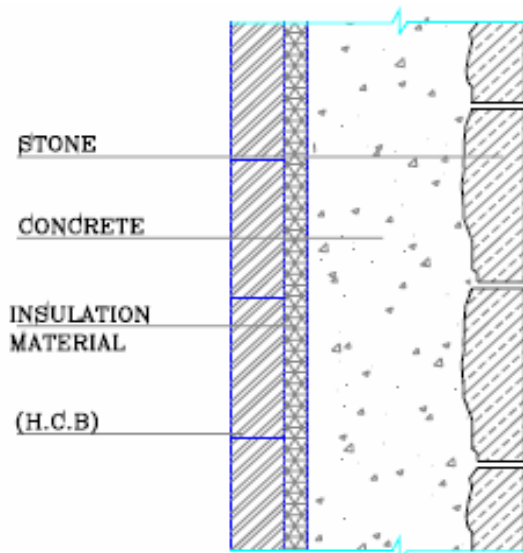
Exterior wall built from stone, concrete, concrete block and insulating material between them.
